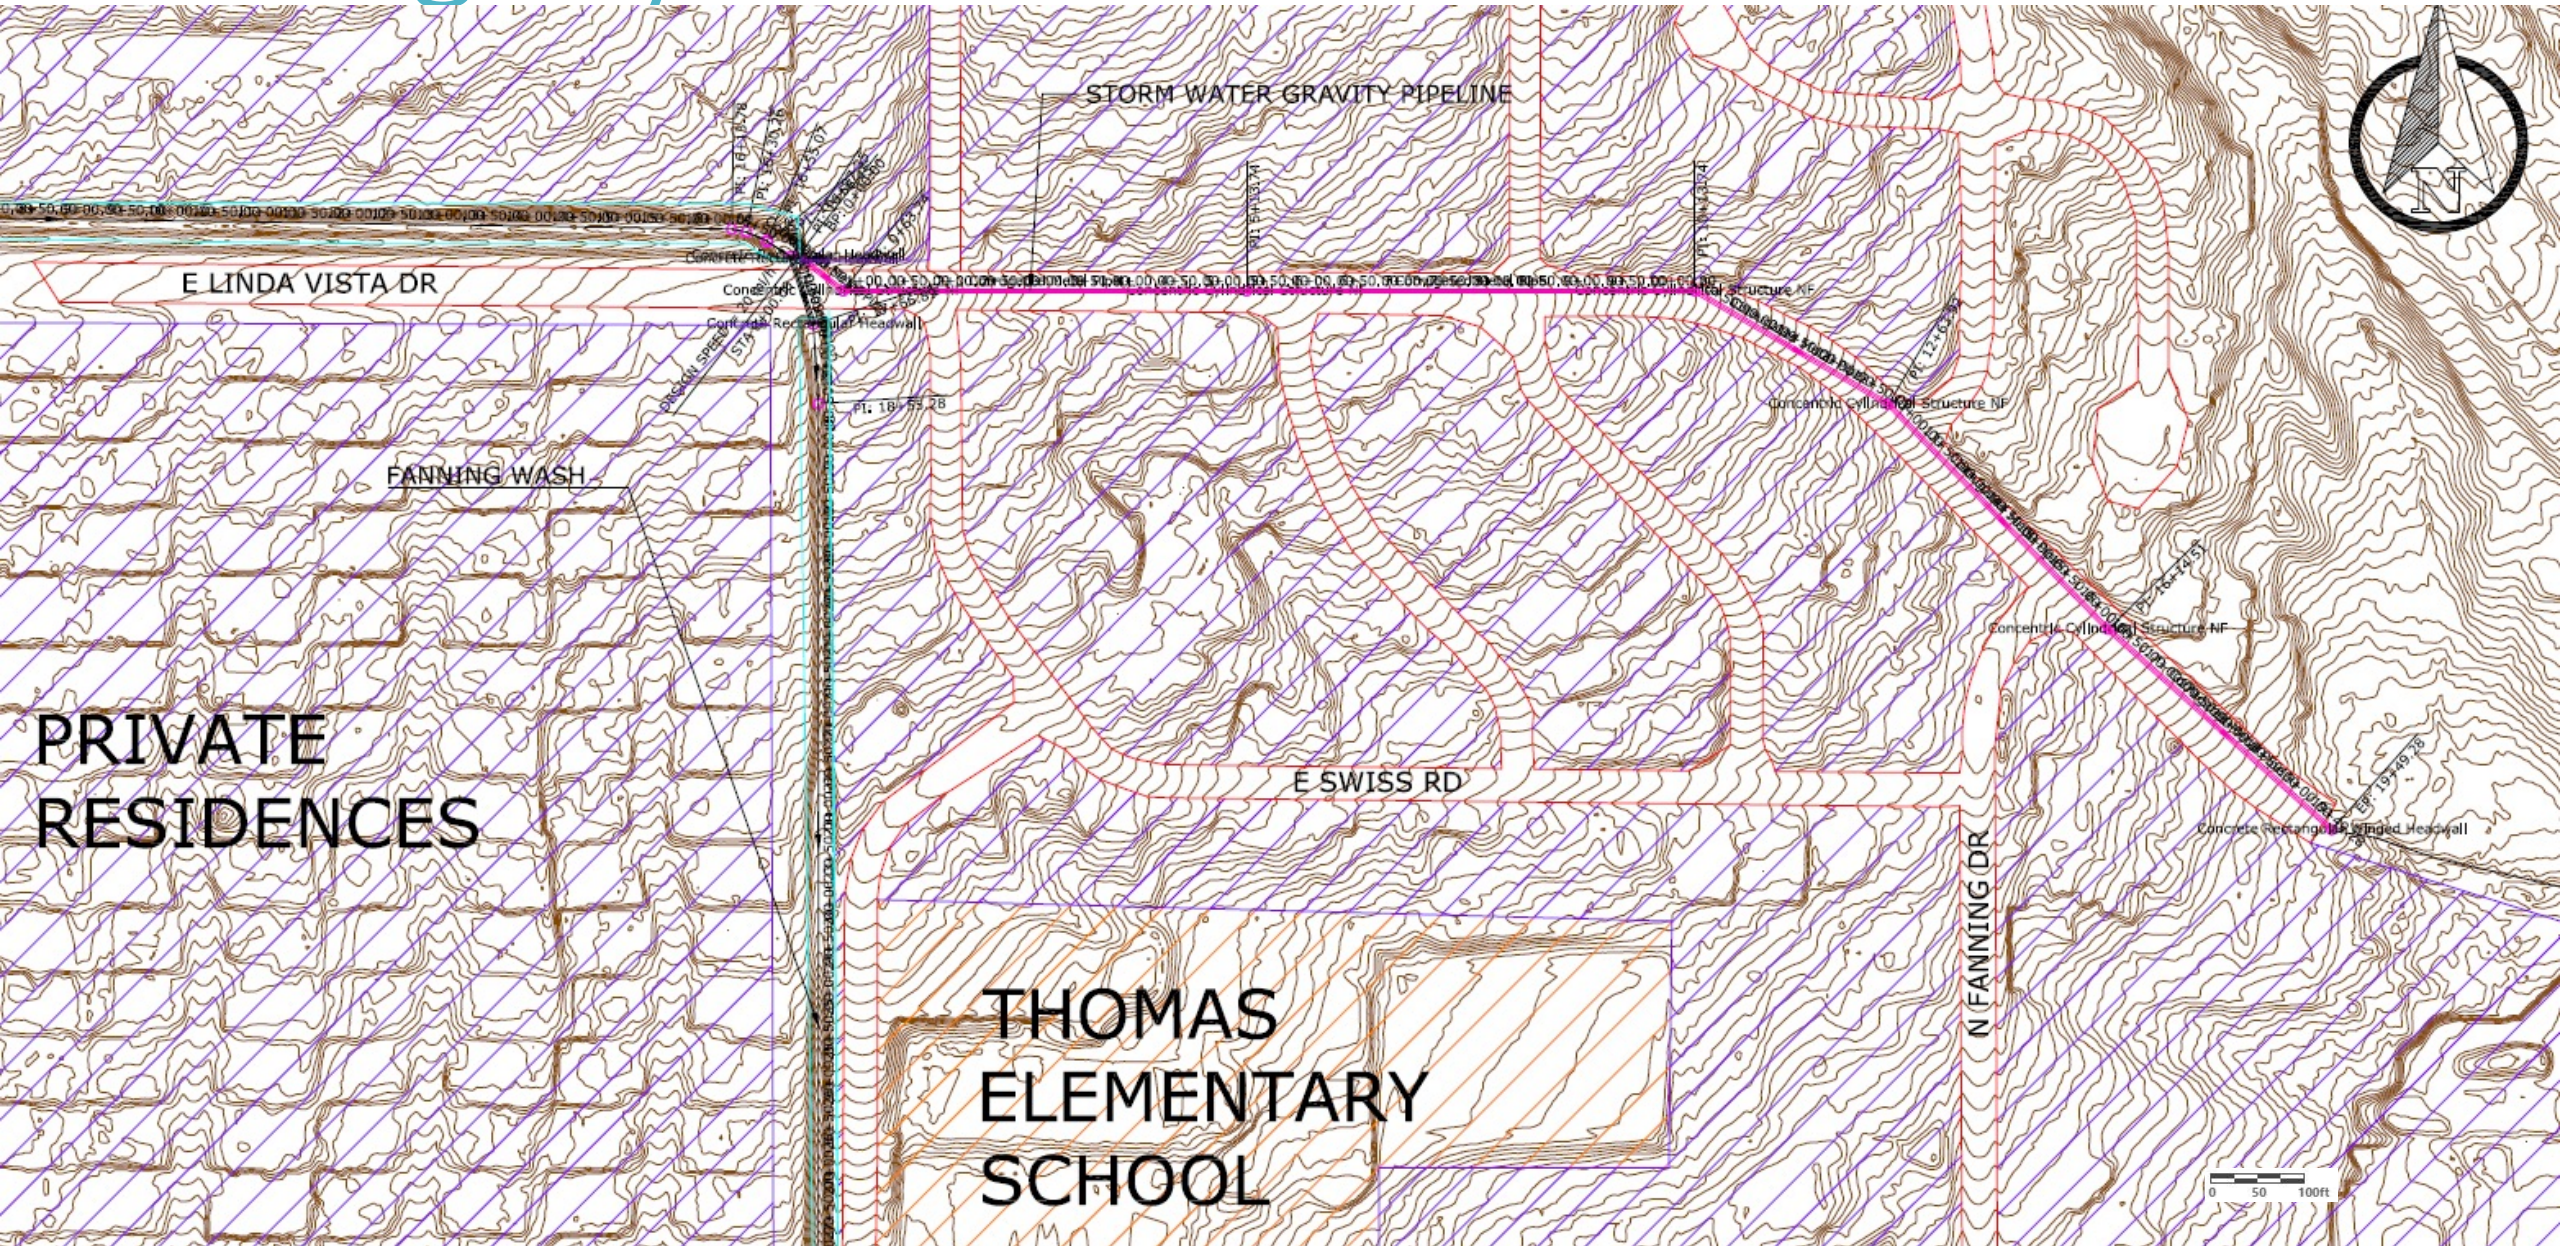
Storm Water Gravity Sewer Pipeline Plans
